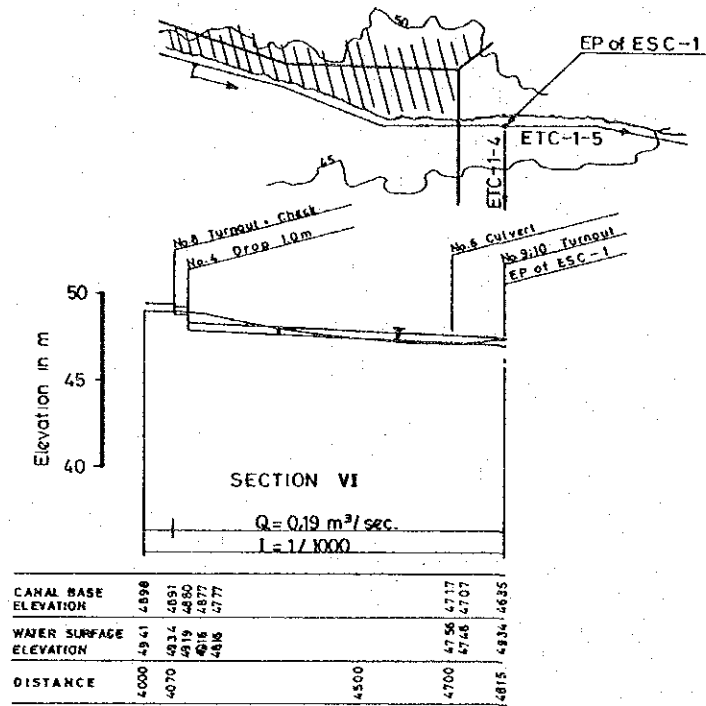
PLAN AND PROFILE OF ESC -1. ( 1/2 )
